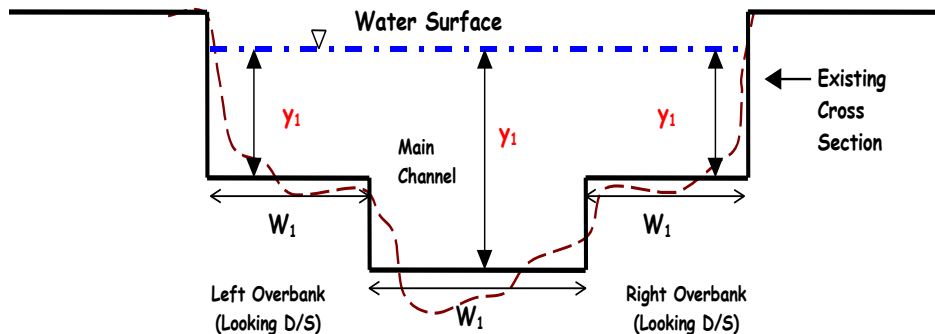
Definition Sketch for ABSCOUR Approach Section (Looking Downstream)
